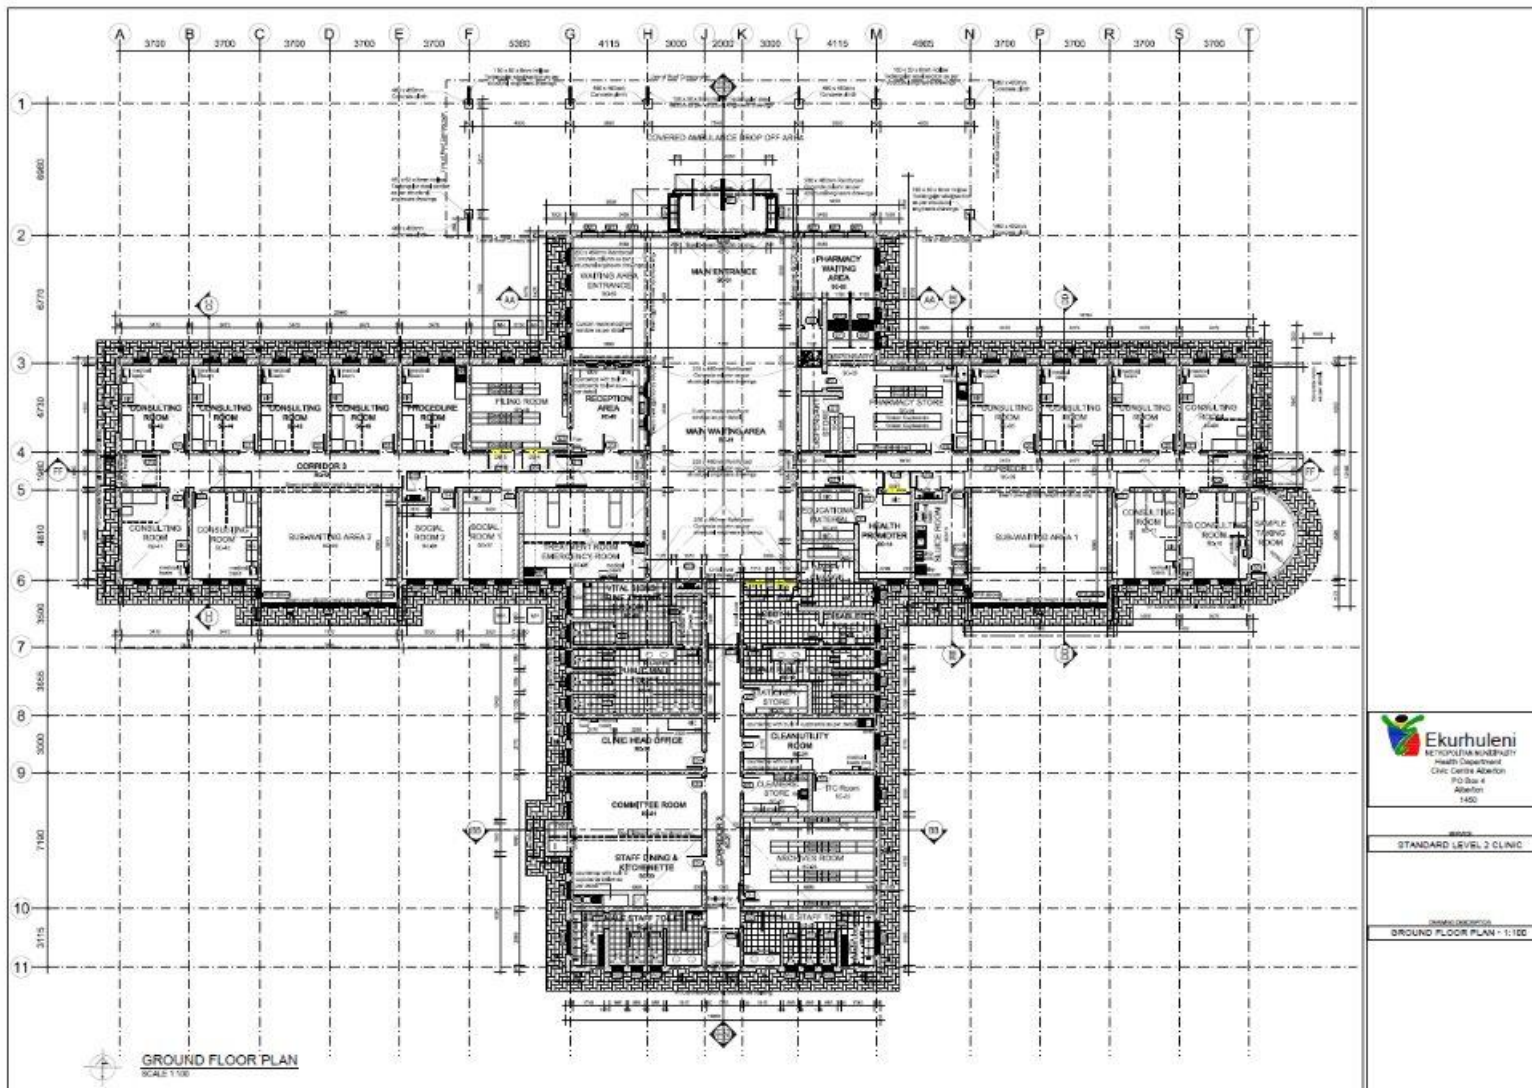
View 4 - Geluksdal Clinic Floor Plan
